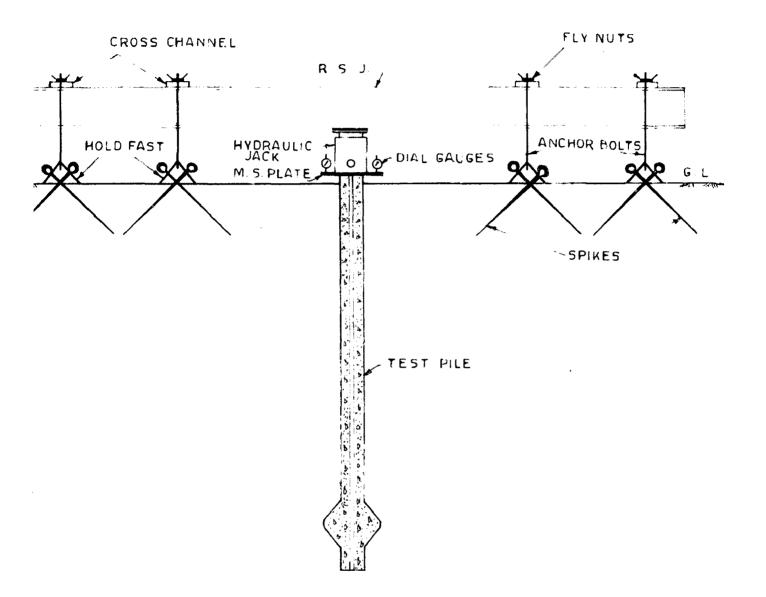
TYPICAL LOAD TEST SET-UP WITH HOLD FAST TYPE ANCHORS
